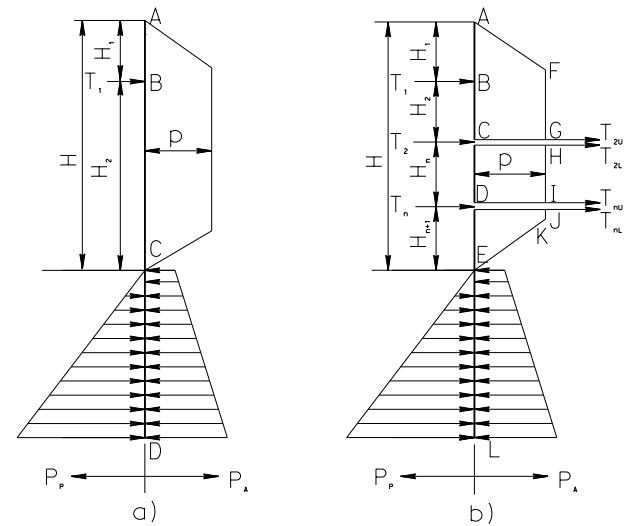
Calculation of Anchor Loads and Pile Embedment Depth for a) One-Level Wall and b) Multilevel Wall
